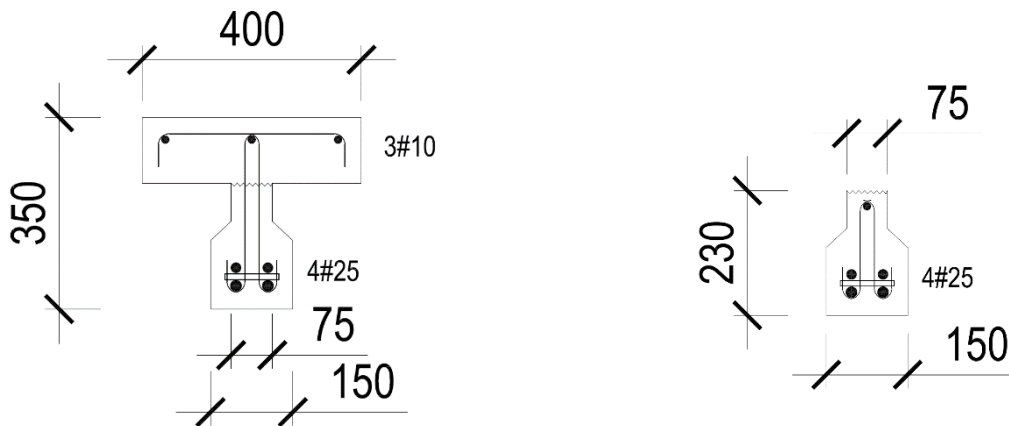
Beam-9 sections with and without a topping flange.
